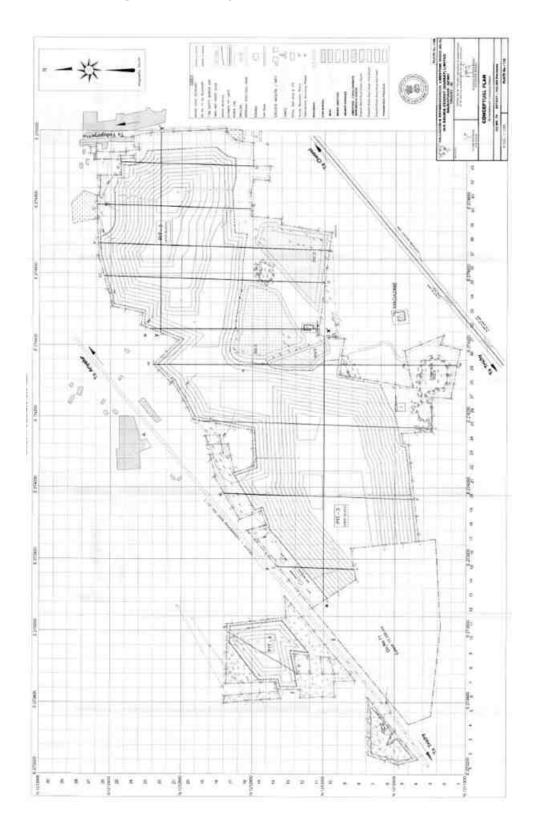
Conceptual Plan - KVK Pit Nos. 3 & 4
